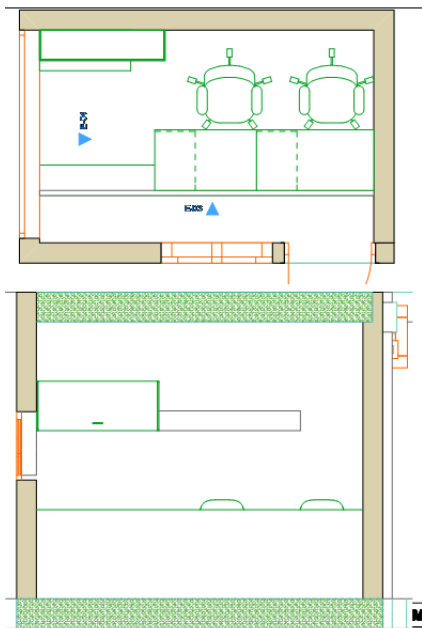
33 Plan & elevation of the existing design of yoeligen hotel reception, Source: (Author, 2020)
